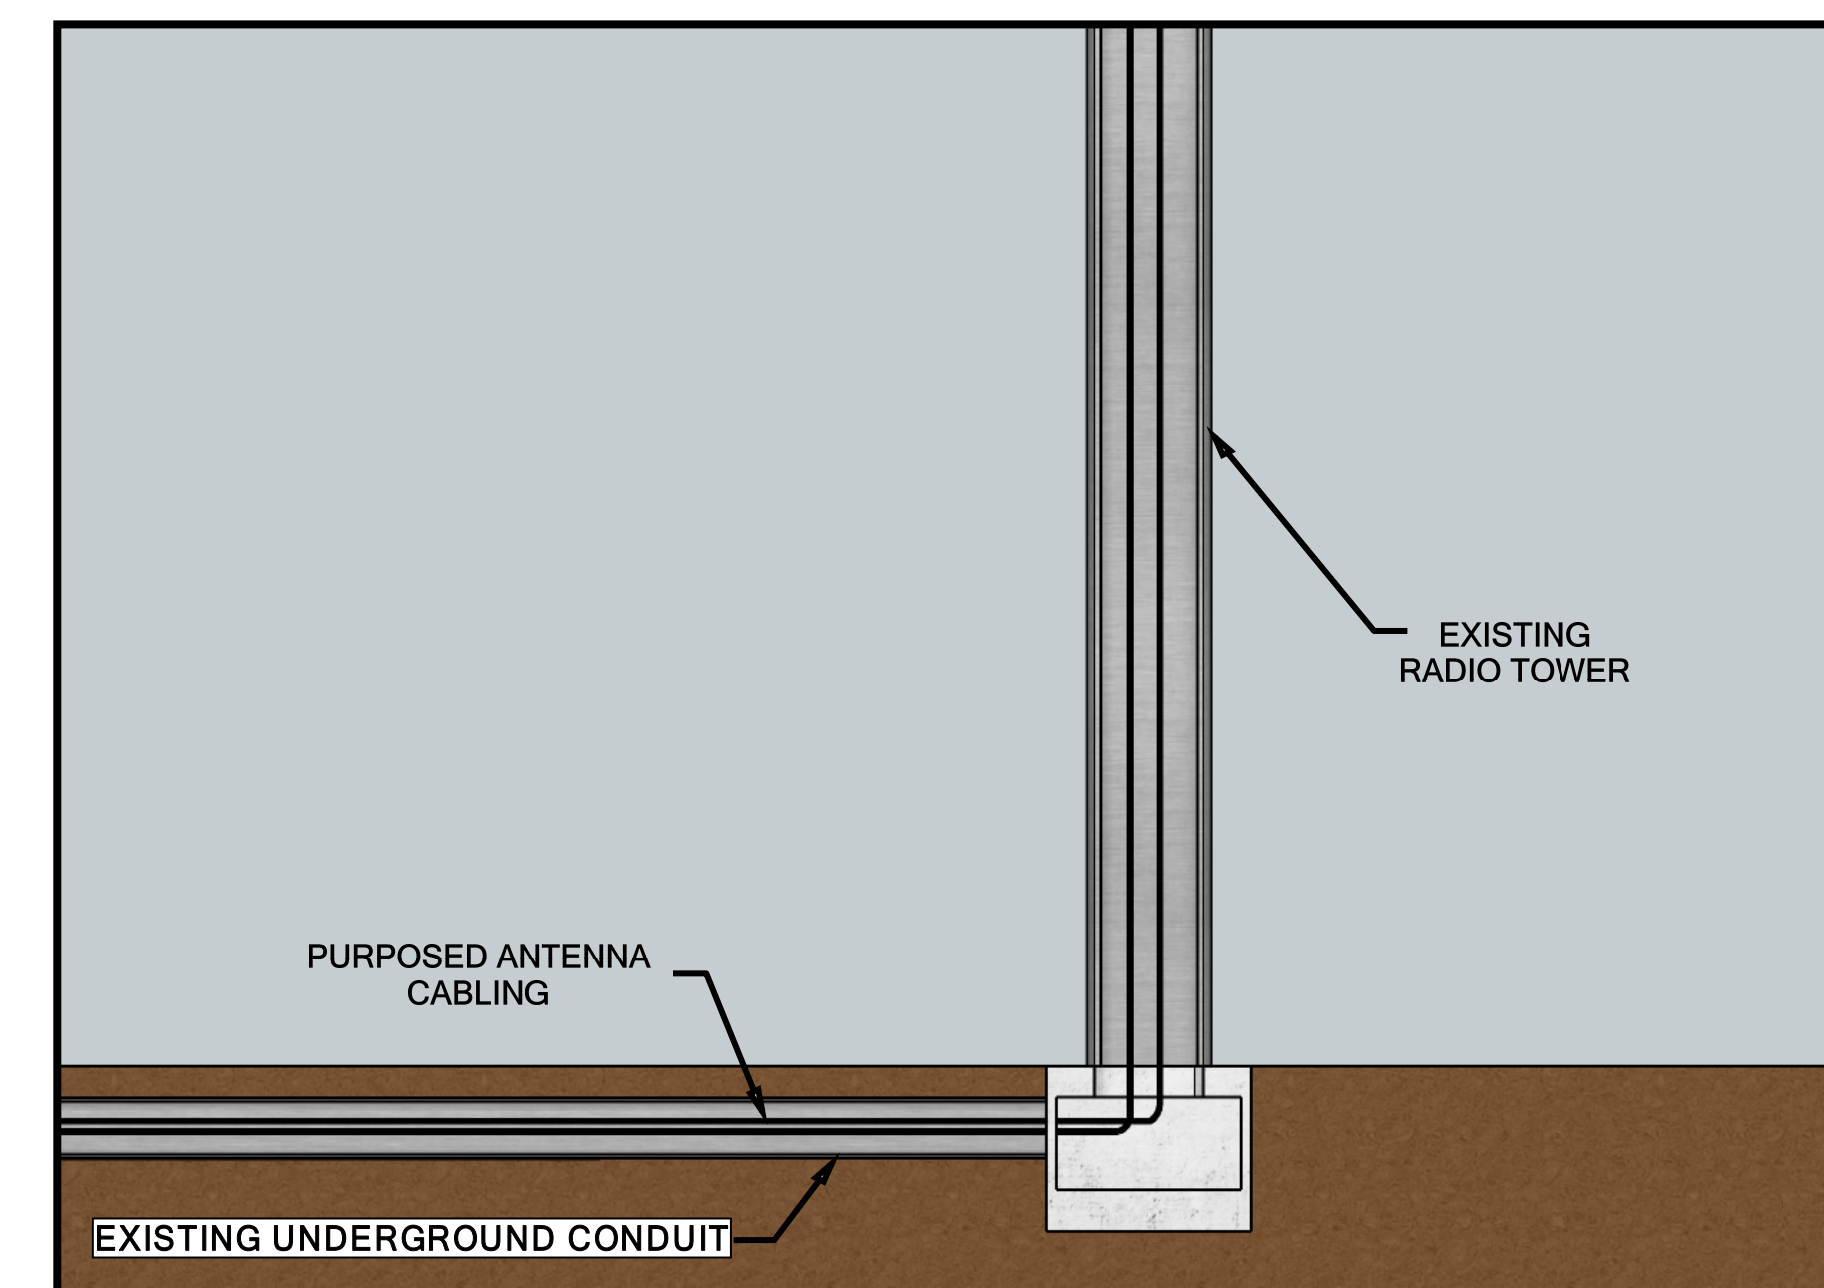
BASE OF EXISTING RADIO TOWER & EXISTING CONDUIT FOR PURPOSED ANTENNA CABLING PATHWAY
